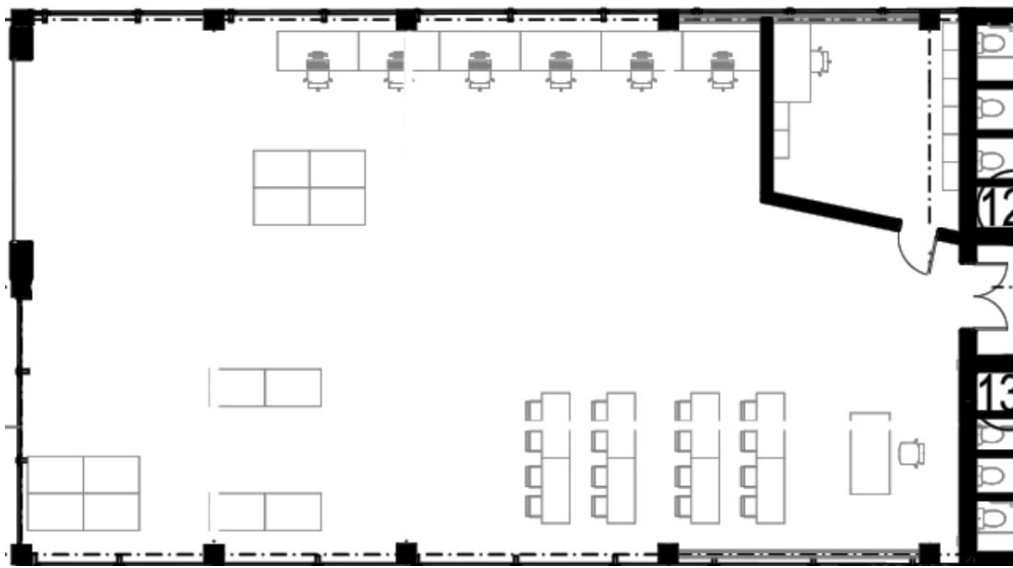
Floor plan of the laboratory in Building 11 [made by the authors]
